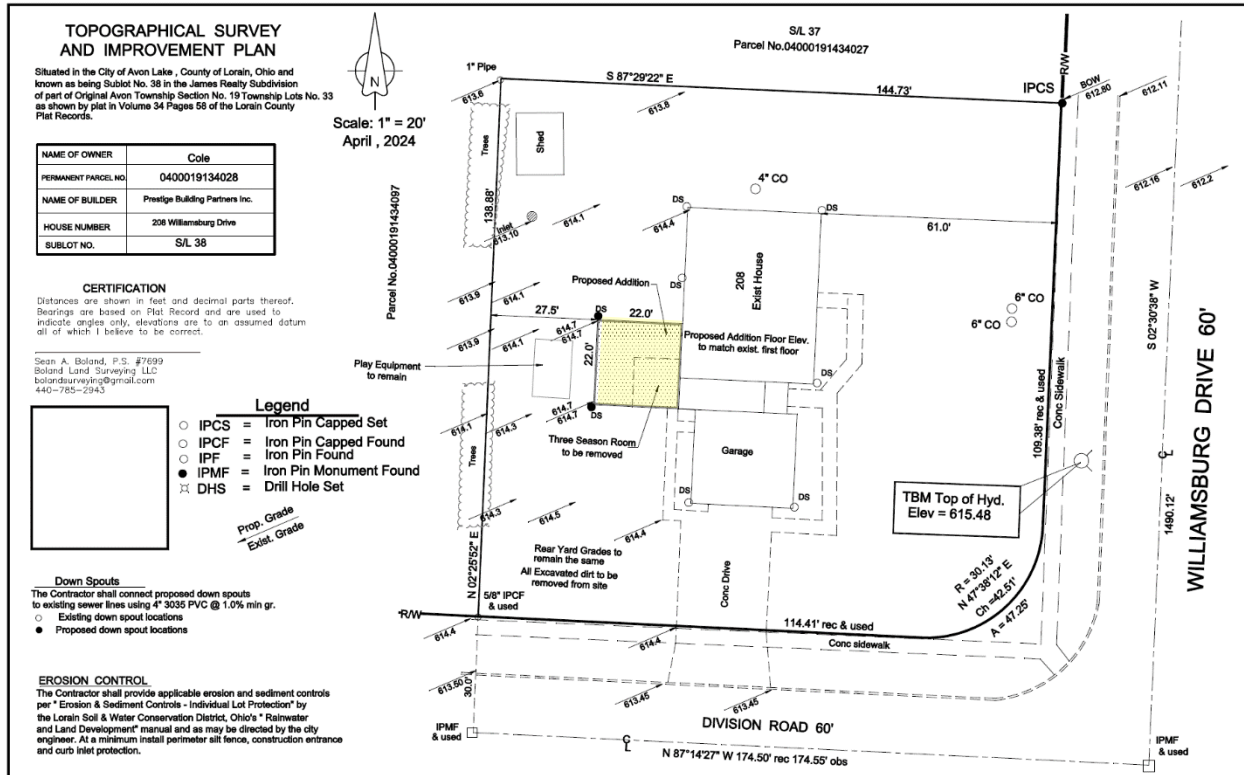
Site Plan – Applicant Provided (CAV 24-22)
